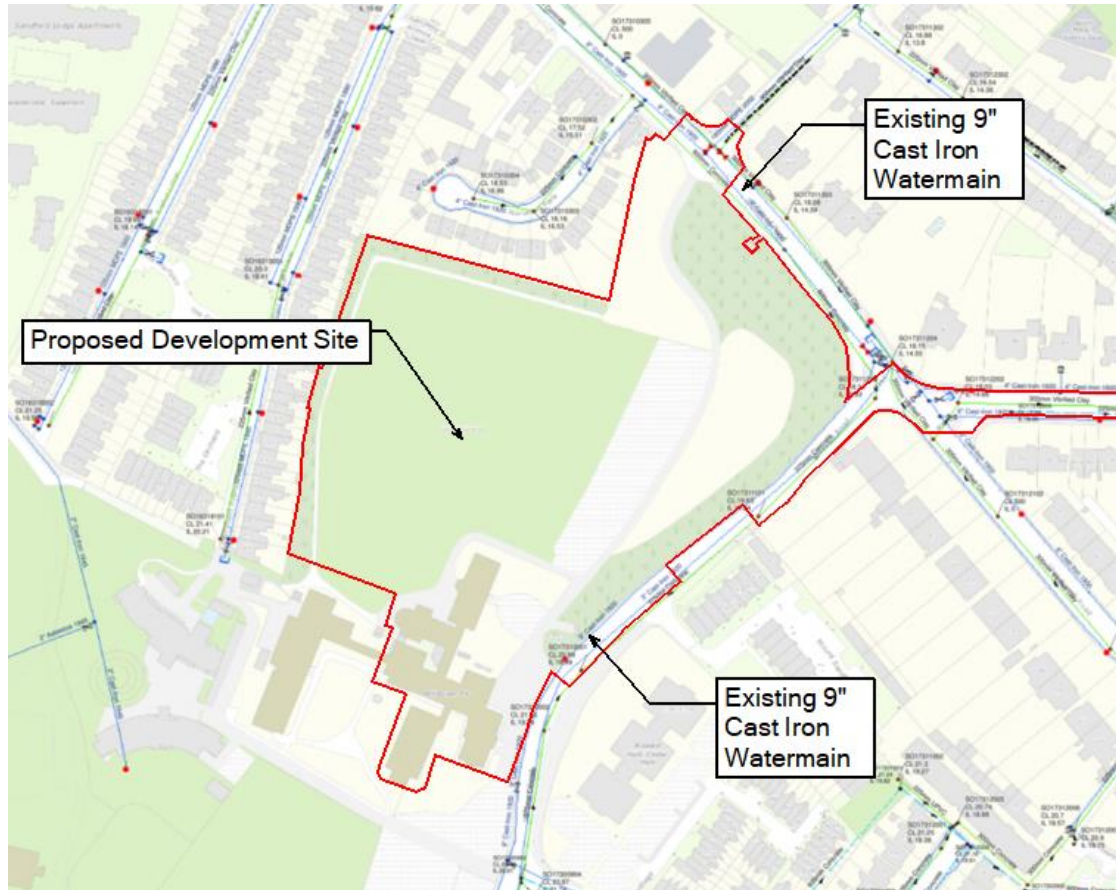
Extract from Irish Water's Network Plan (Site Boundary Indicative Only)
